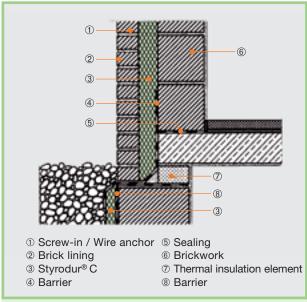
Perimeter insulation connected to brickwork with cavity wall insulation.
